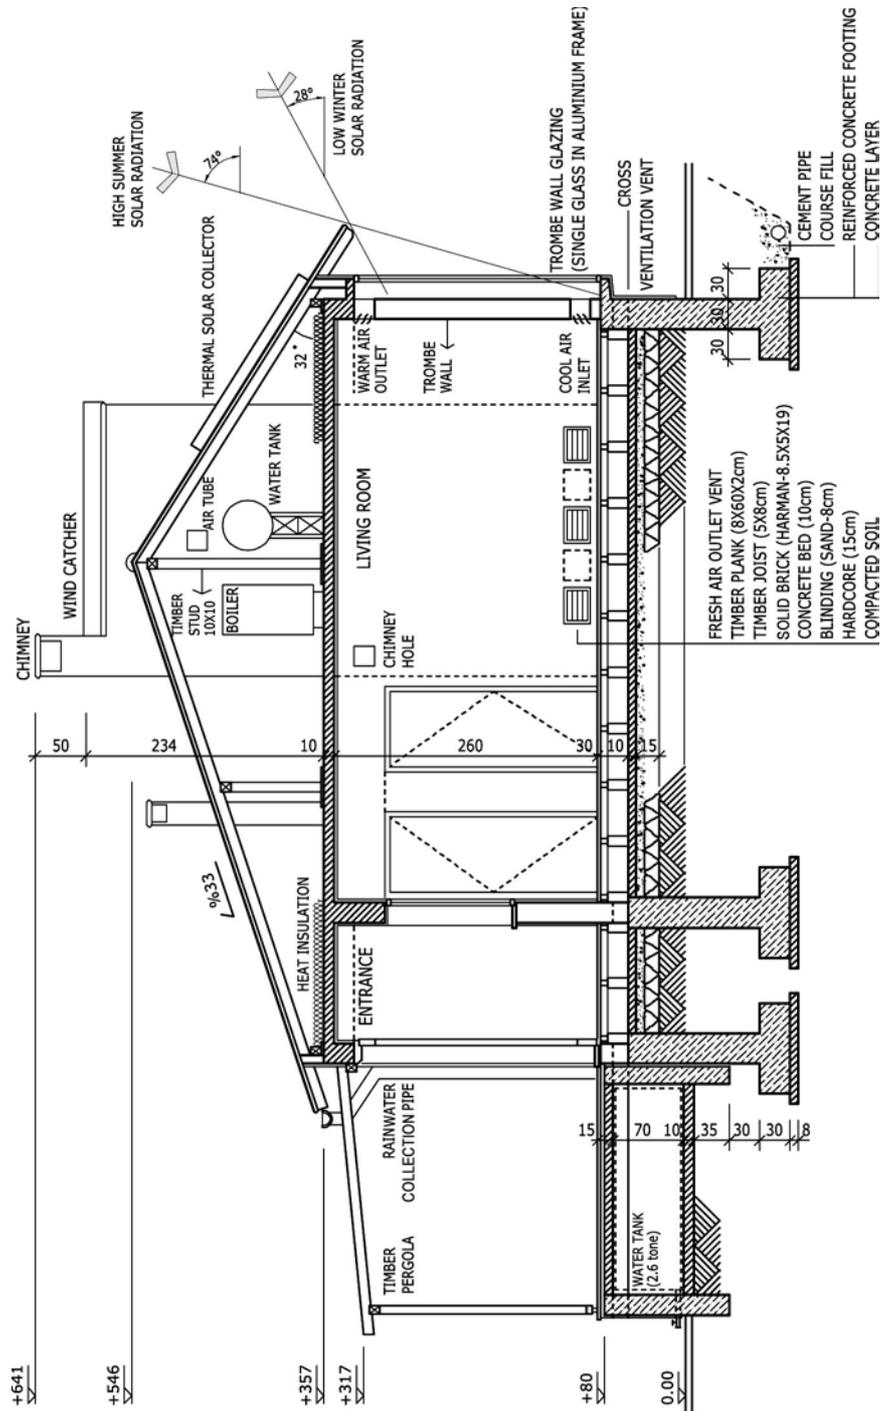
Section B-B of type D₁' dwelling; Scale 1/80
